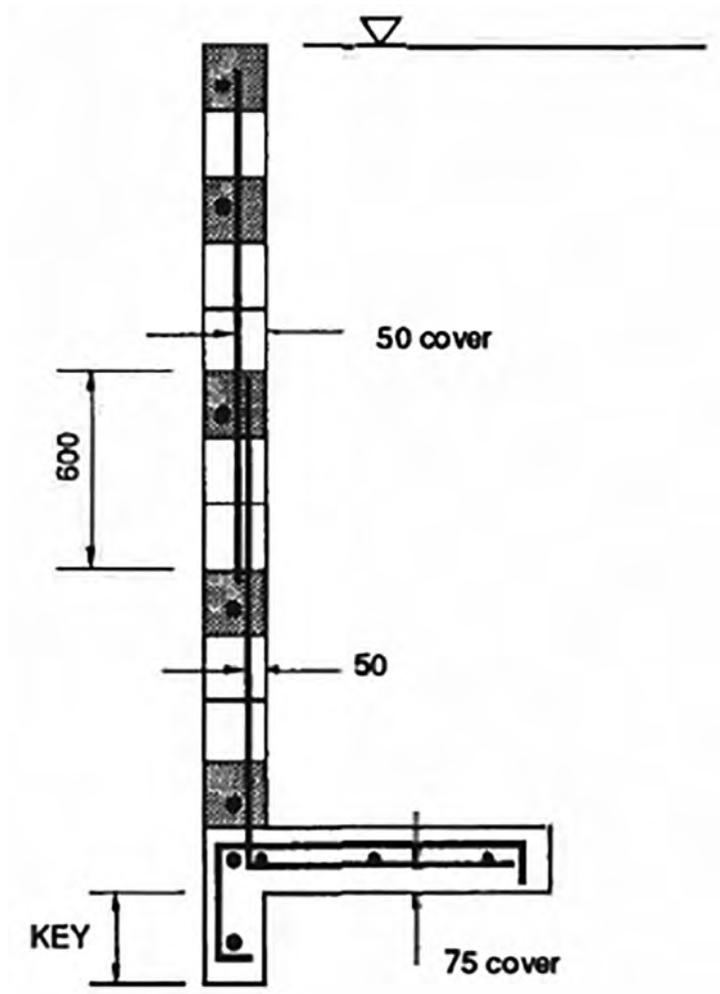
REINFORCEMENT DETAILS FOR TYPE 2 RETAINING WALLS
